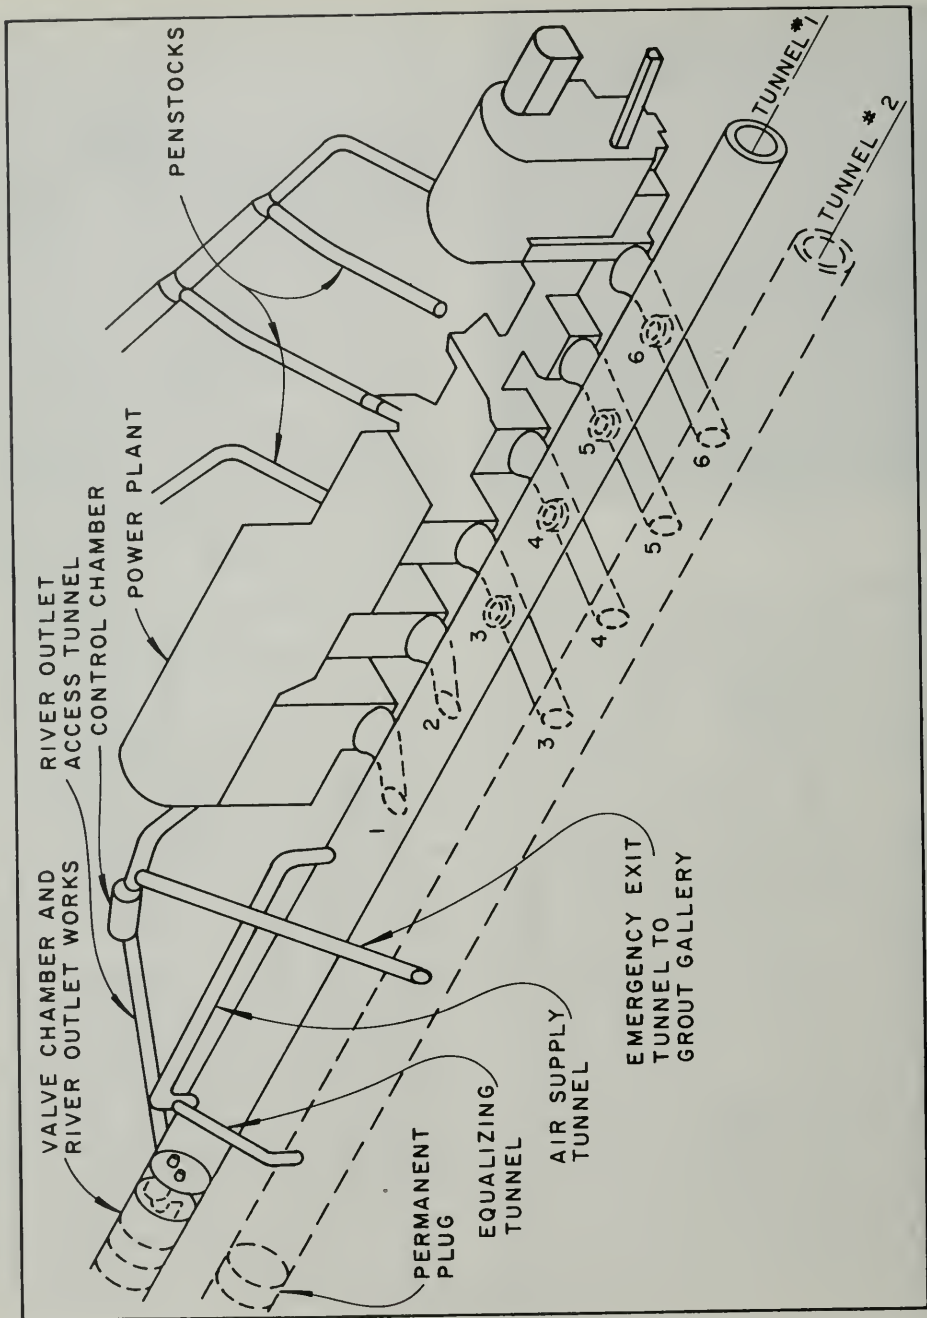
Diversion Tunnels Nos. 1 and 2—Draft-Tube Arrangement
